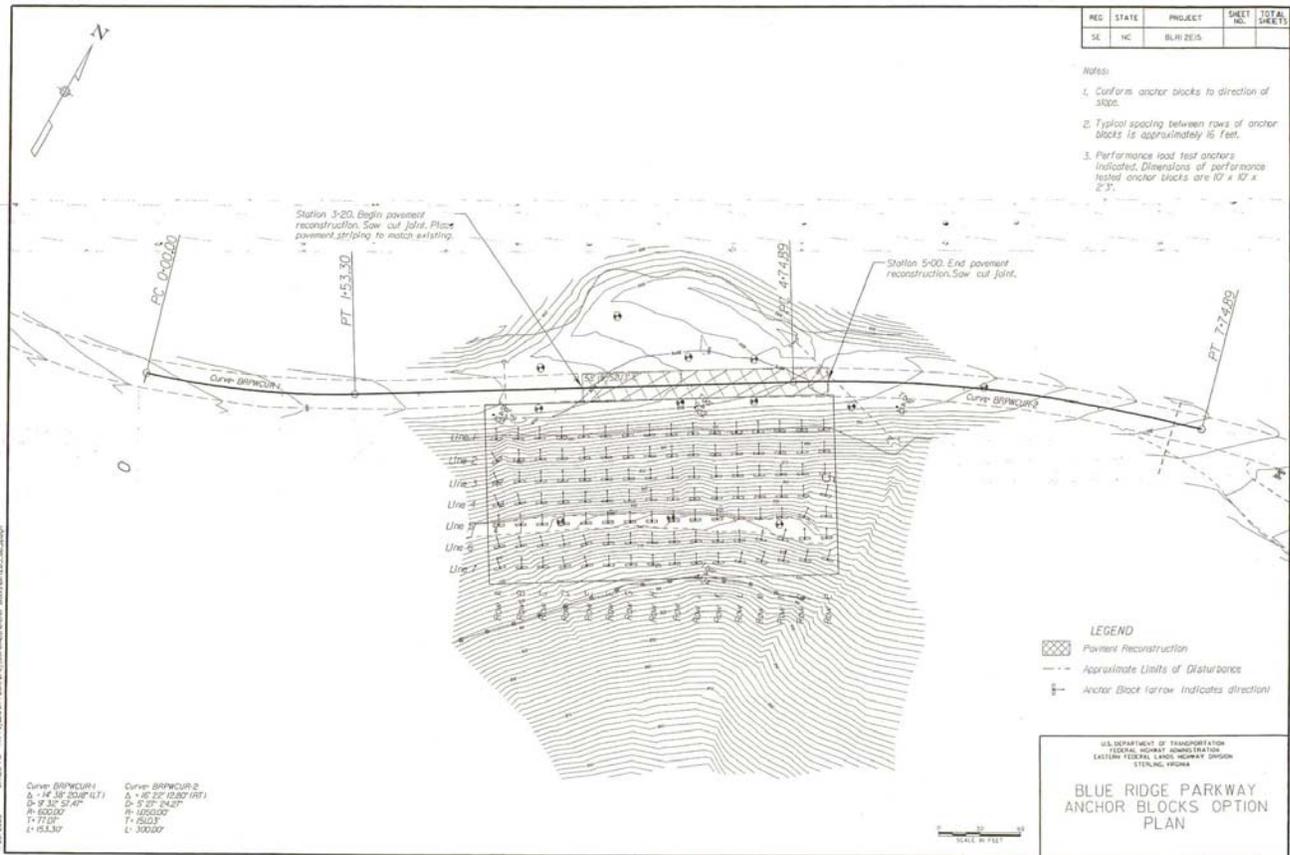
Alternative B: example of anchor block system installed at other slide area sites with similar geotechnical analysis.
